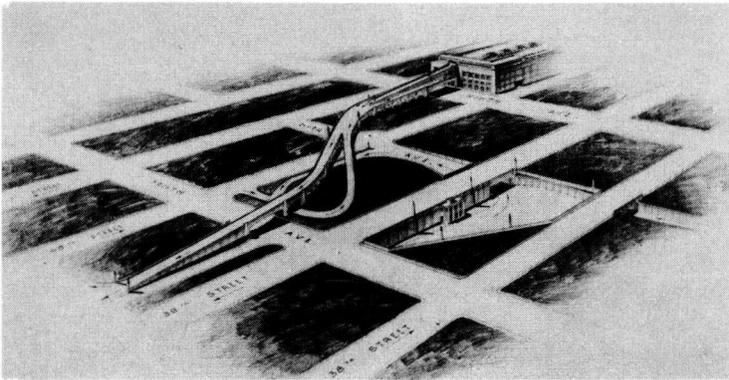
Sketch of Proposed Ramp Connections Between the Port of New York Authority's Lincoln Tunnel and the Mid-Manhattan Union Bus Terminal to be Constructed by the Port Authority.
